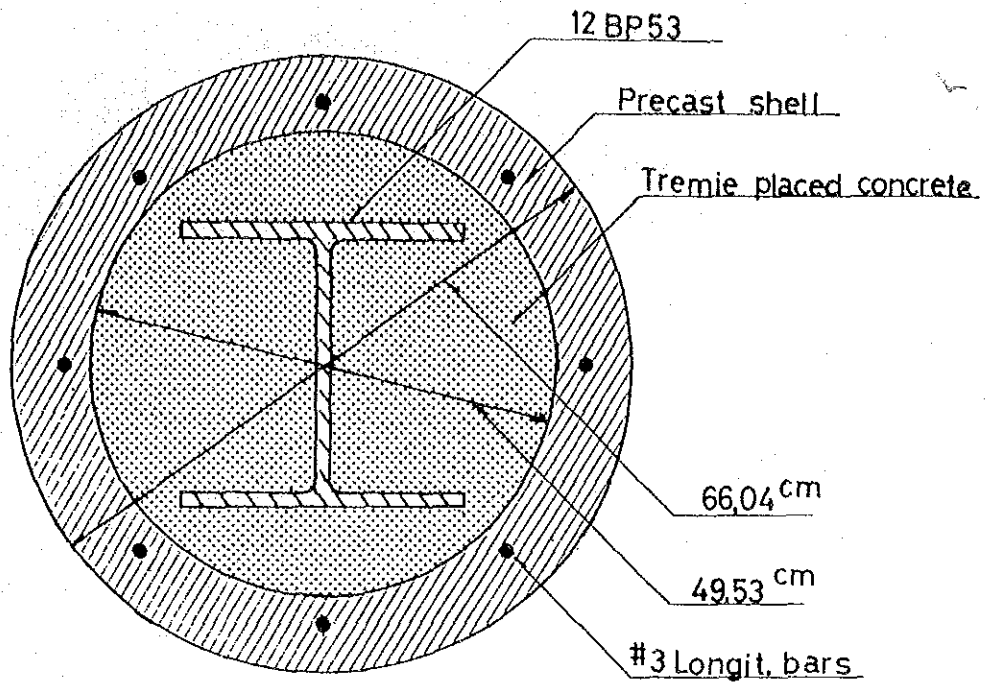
Typical Cross Section of the 12BP53 Piles
